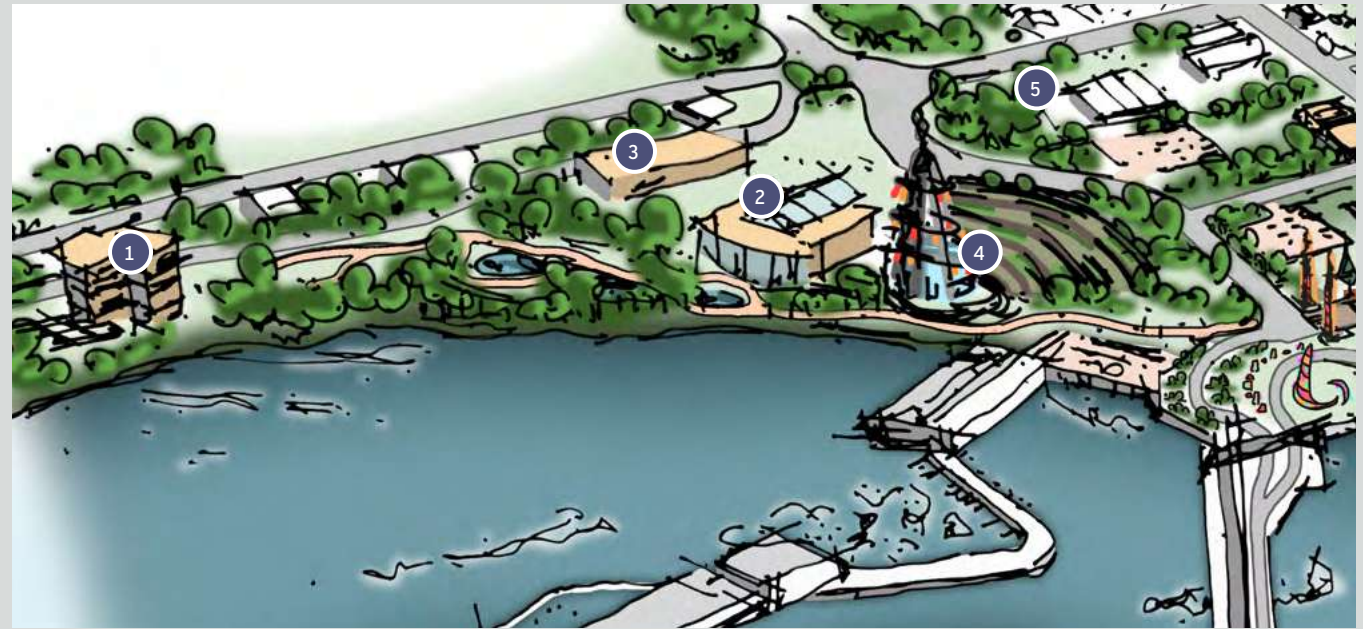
3D RENDERING OF REDEVELOPMENT CONCEPT PLAN (LOOKING NORTHEAST)
